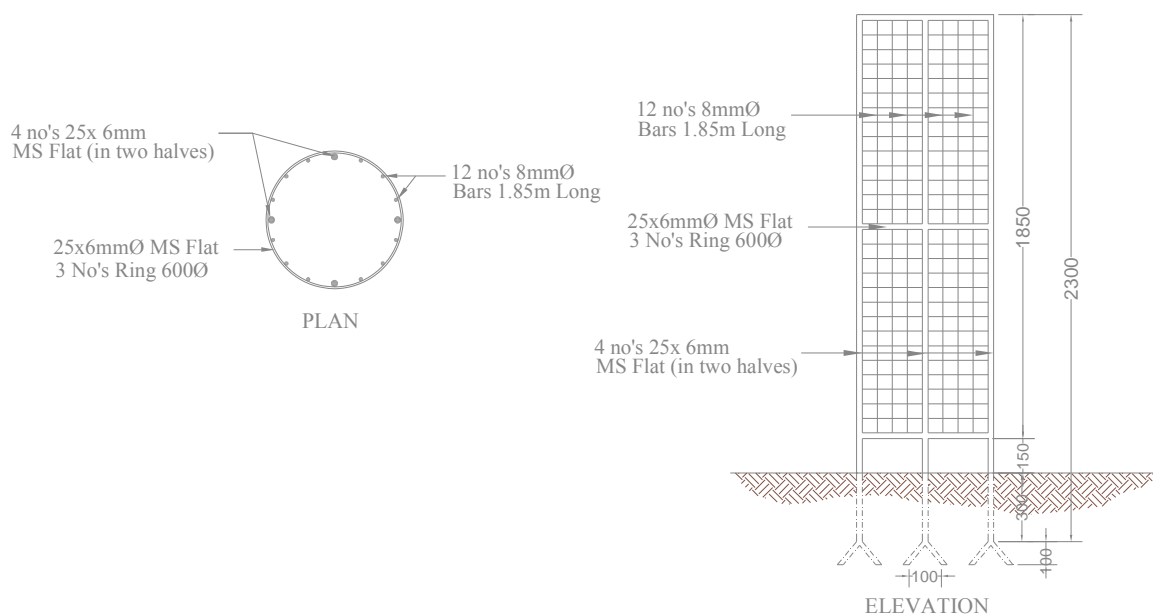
Conceptual Plan for Avenue Plantation
